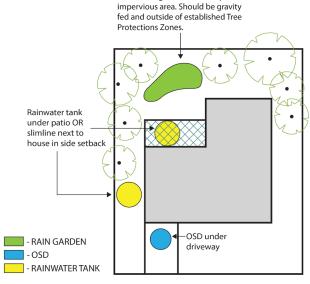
A.3-1: Allow sufficient space for installation and operation of required water measures.
